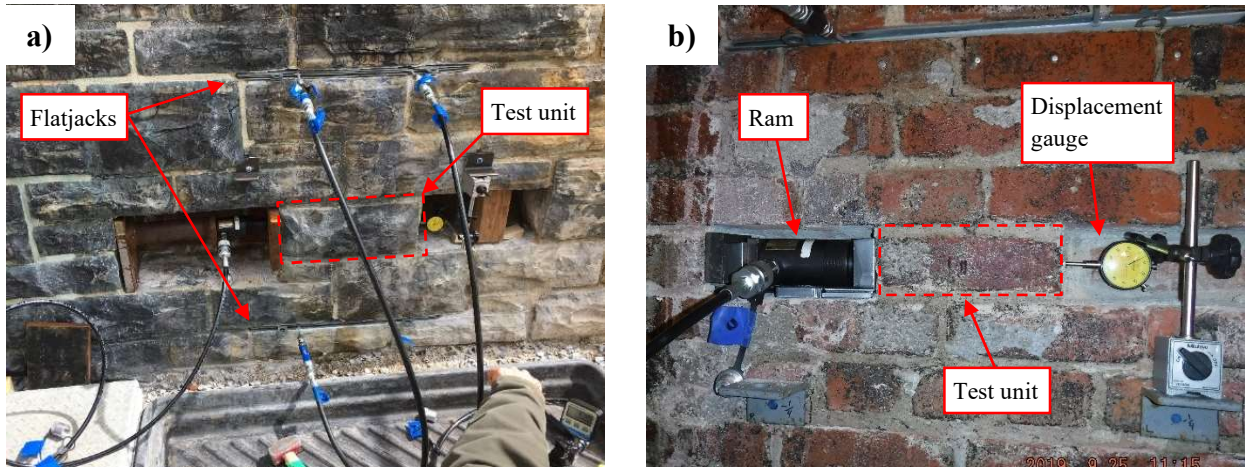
Typical Test Set-up for ASTM C1531 in a) Exterior stone masonry, and b) Interior brick masonry
